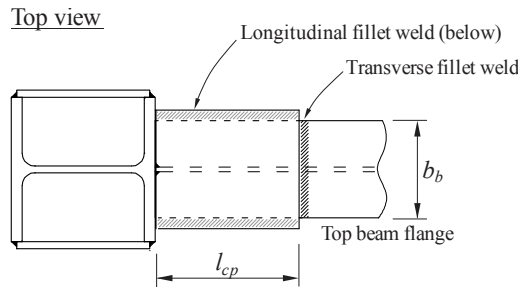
Three-sided fillet weld joining the cover-plate to the beam flange
